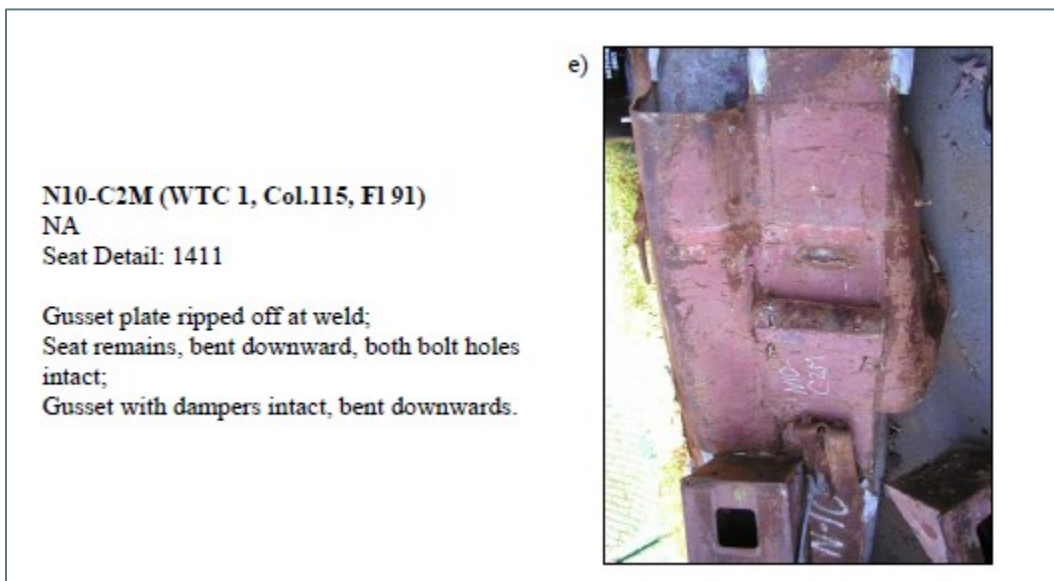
A perimeter column floor truss connection from floor 91 of the North Tower ("Zone 2") indicates downward acting forces that bend the gusset plate and seat downward based on the geometry of the destruction. (NIST NCSTAR 1-3C, p391)
